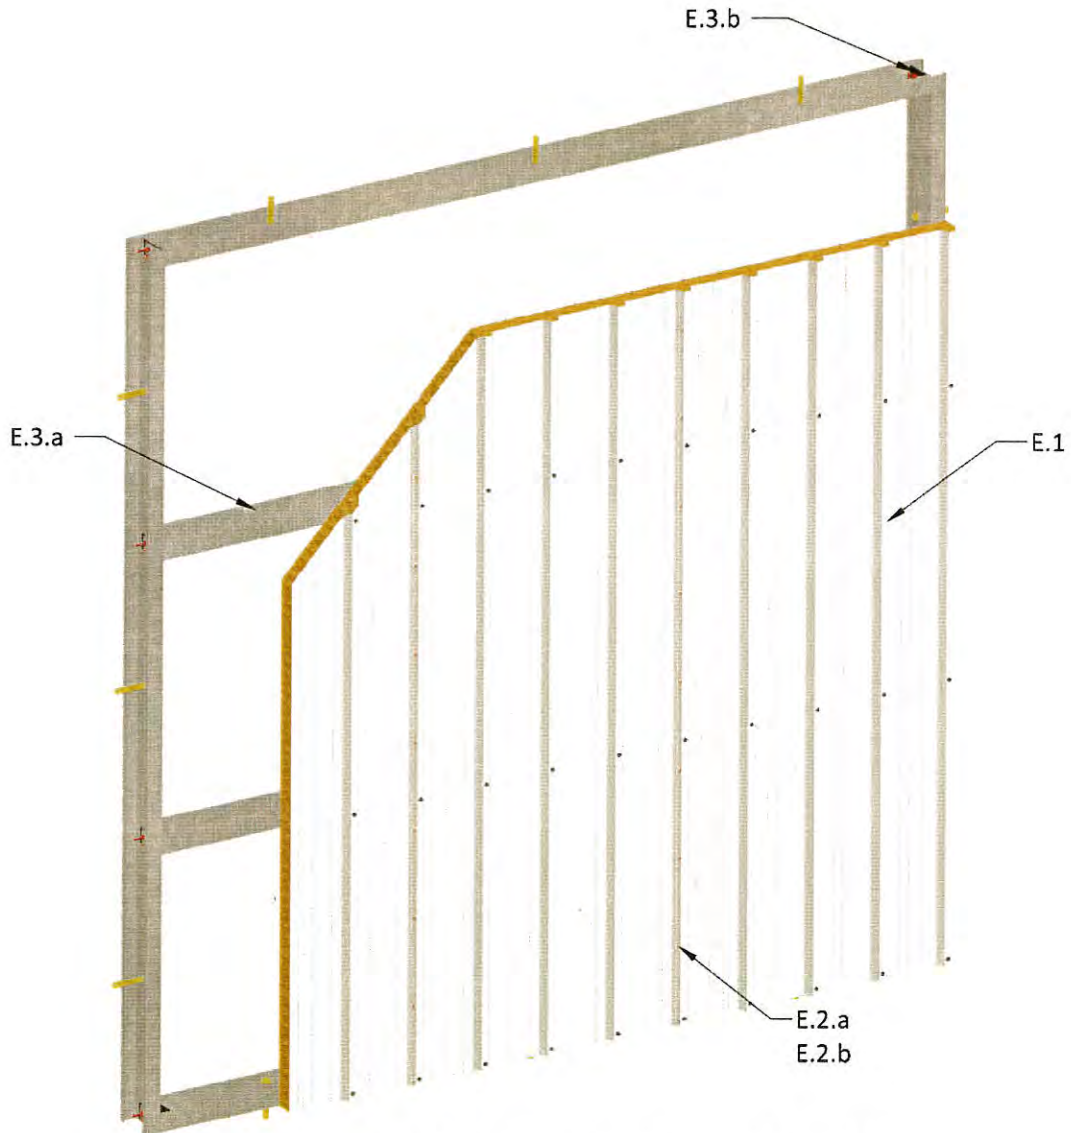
Typical Detail – Non-Loadbearing Partition Assembly
